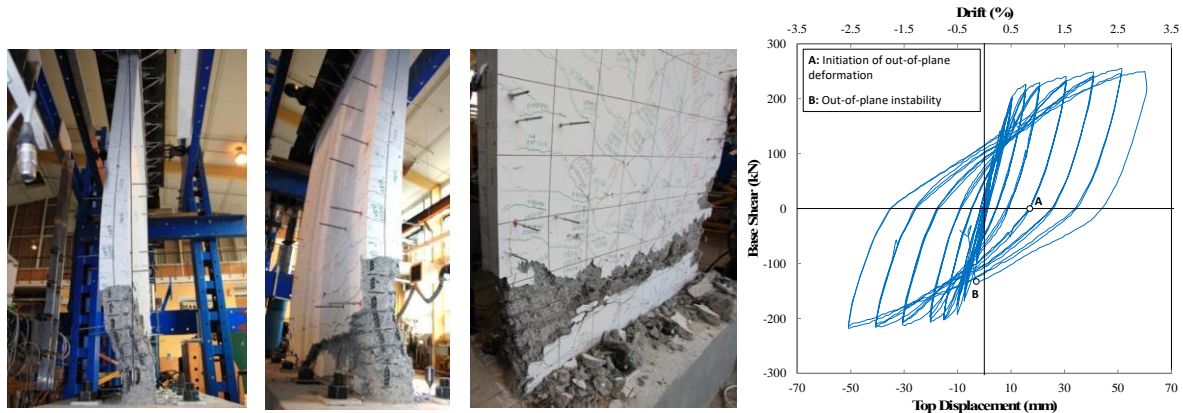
Out-of-plane instability and concrete crushing of a wall test reported by Dashti et al. (2018).
